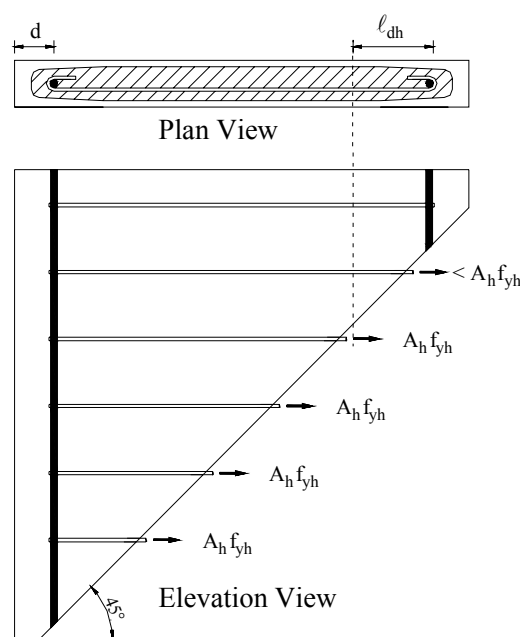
Reduced efficiency of shear reinforcement in masonry wall.
